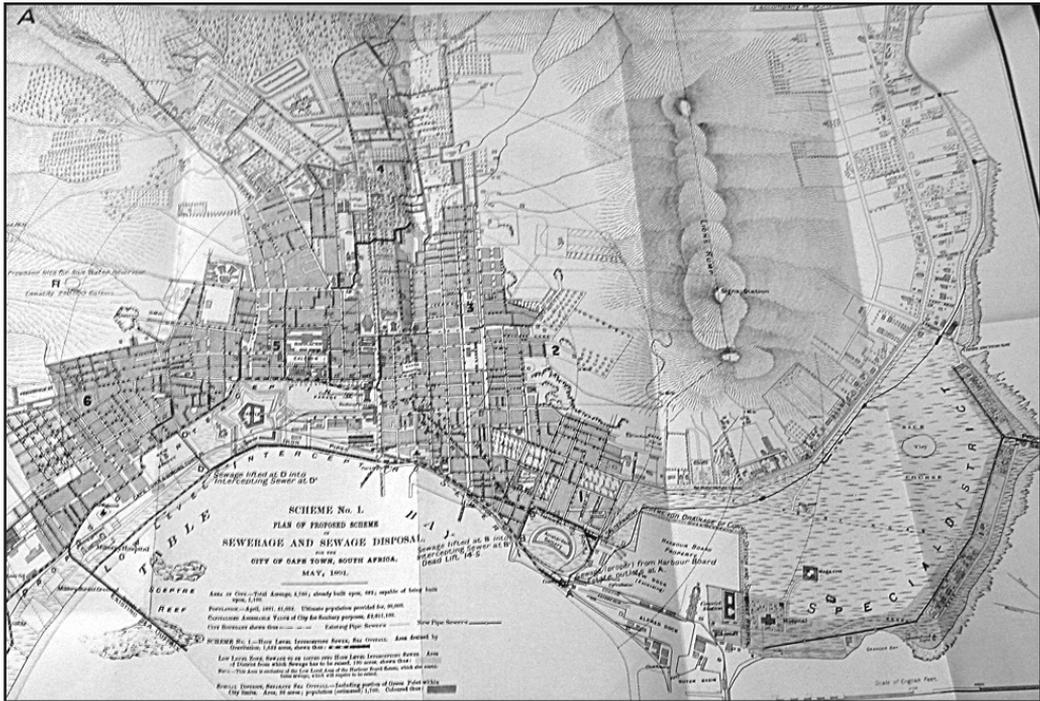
Sewerage and sewage disposal plan for Cape Town in 1891. (CCP, G51-1891)
